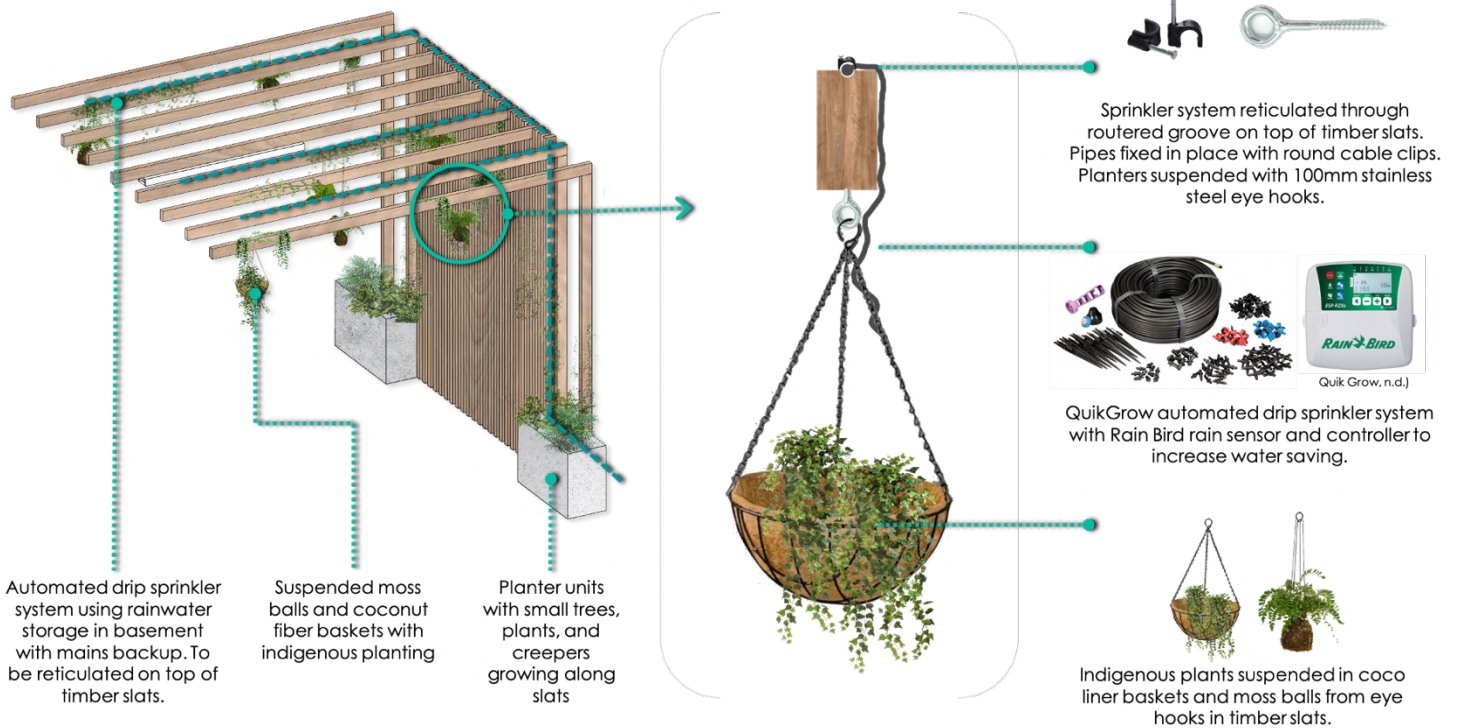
Conceptual diagram indicating general approach to planting and sprinkler systems (Author, 2021).
